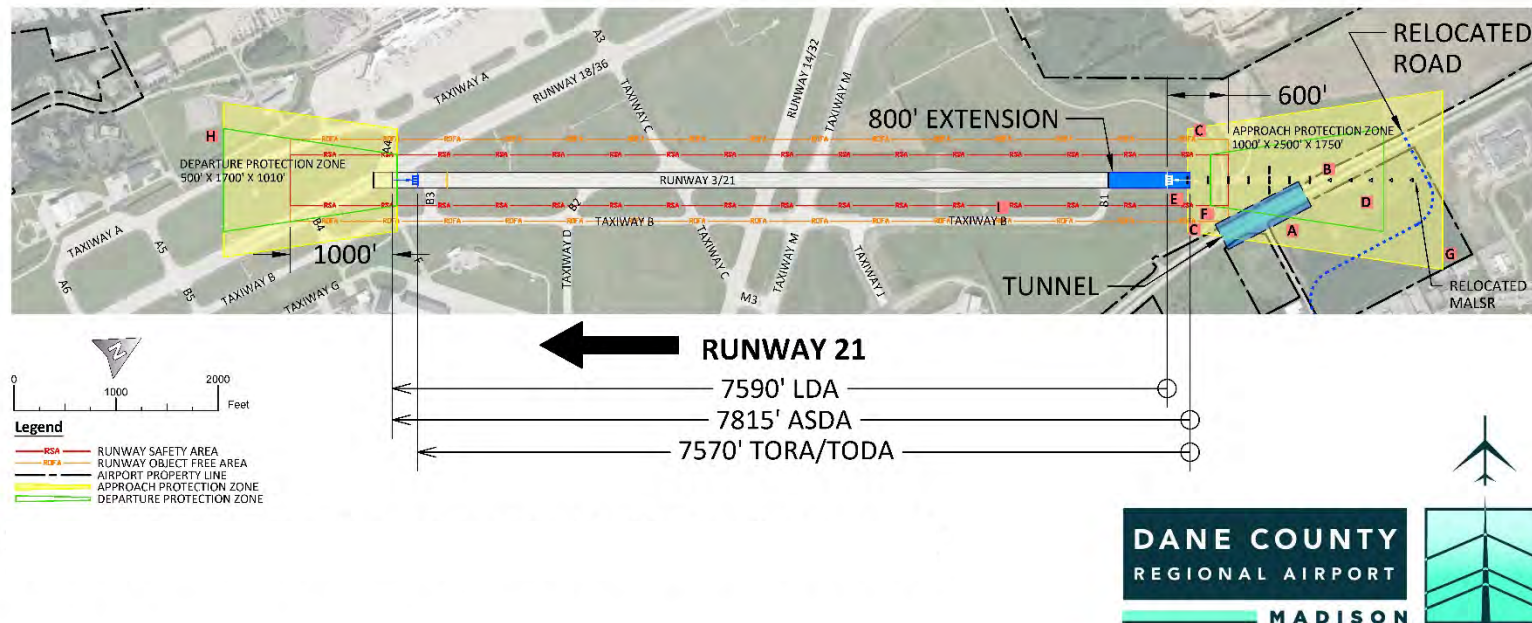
Alternative 3 – Extend Runway 21 North with Tunnel
